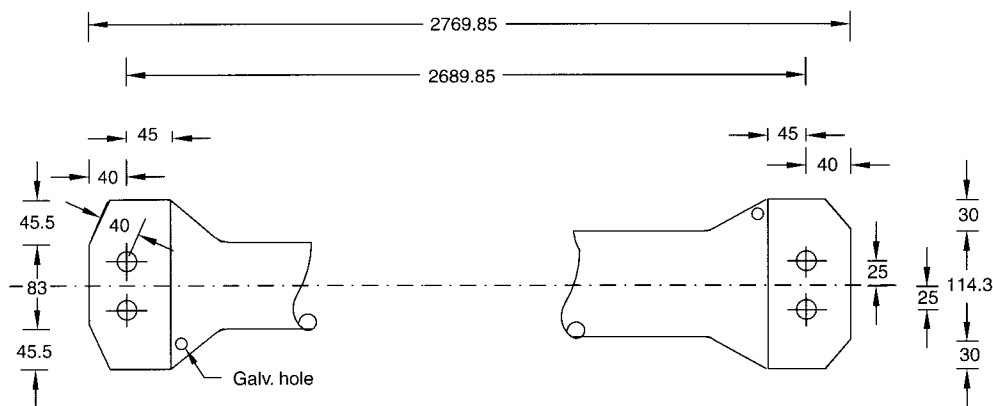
Details of a typical diagonal bracing member at node 69
